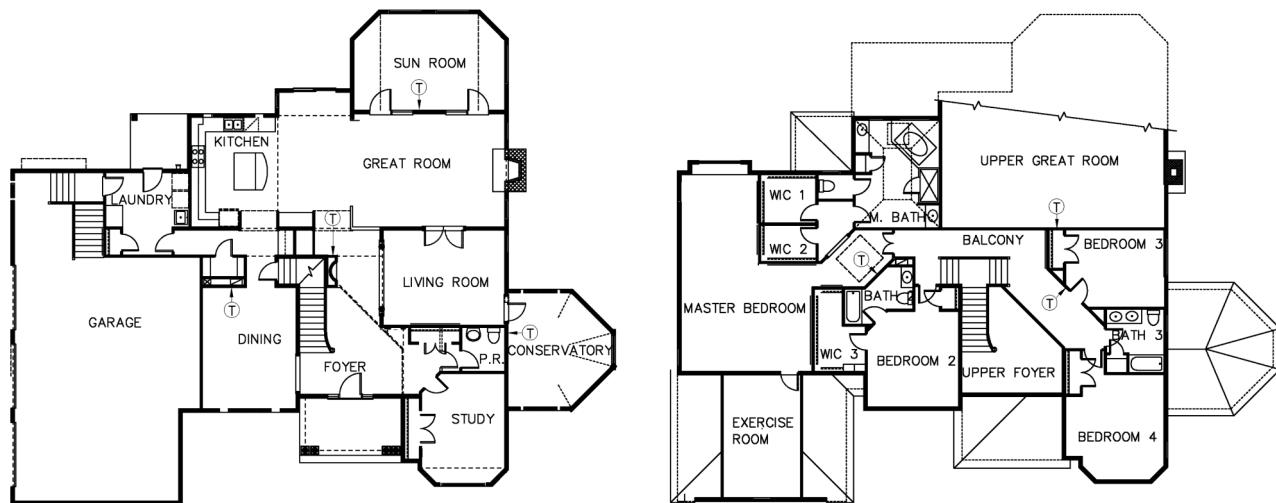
New Jersey prototype house 1st floor plan (left) and 2nd floor plan (right). Temperature measurement locations are indicated.
